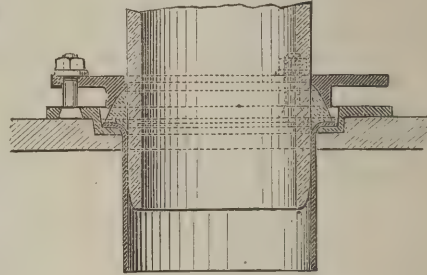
Sectional View of The Havanagh Floor Connection.
